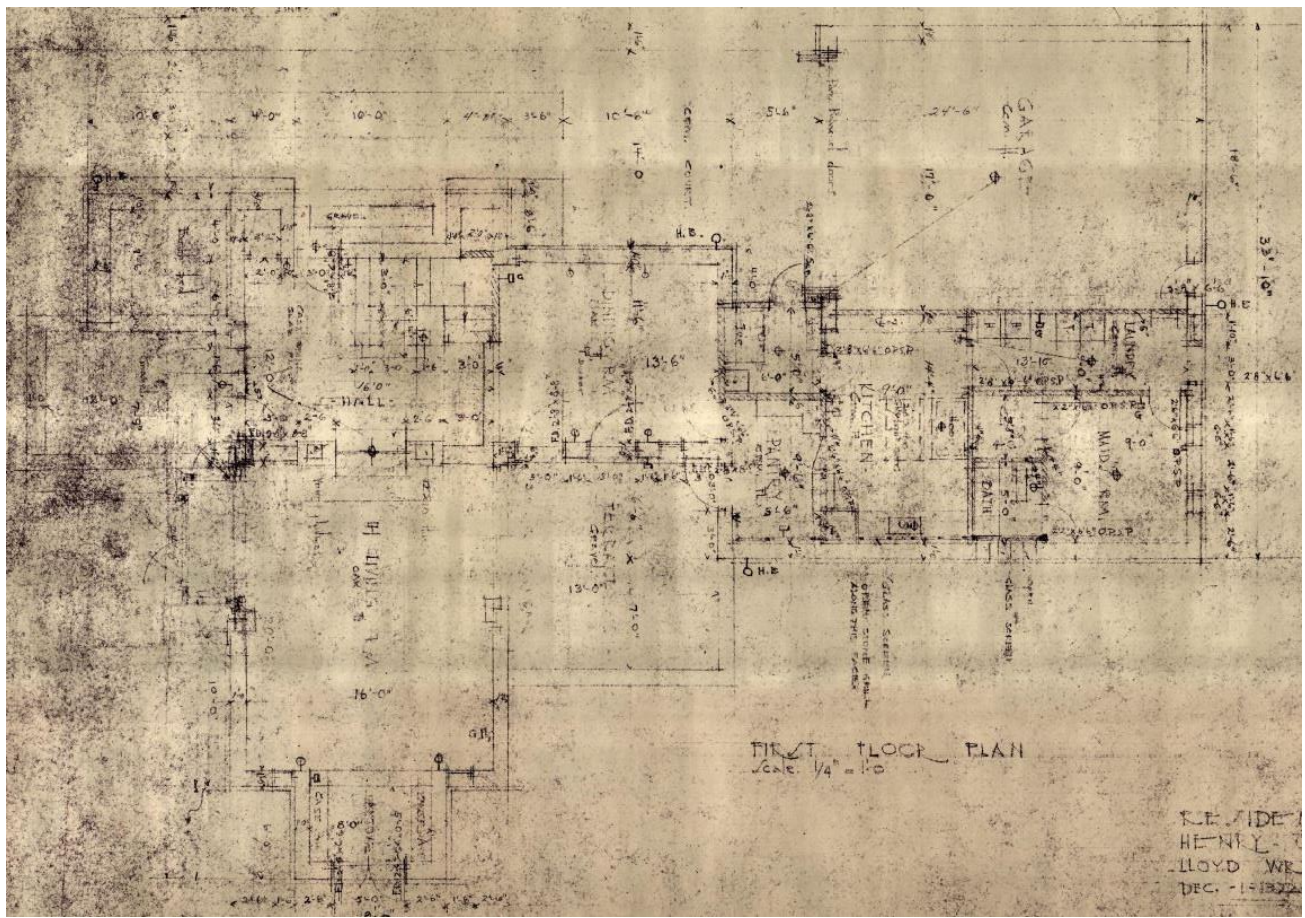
The first floor plan of the Henry Bollman House, 1922.
